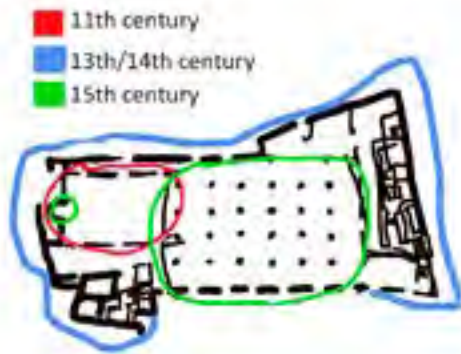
The Great Mosque at Kilwa, Tanzania. Major periods of construction are noted. Floorplan drawn after a posted diagram at the site.
